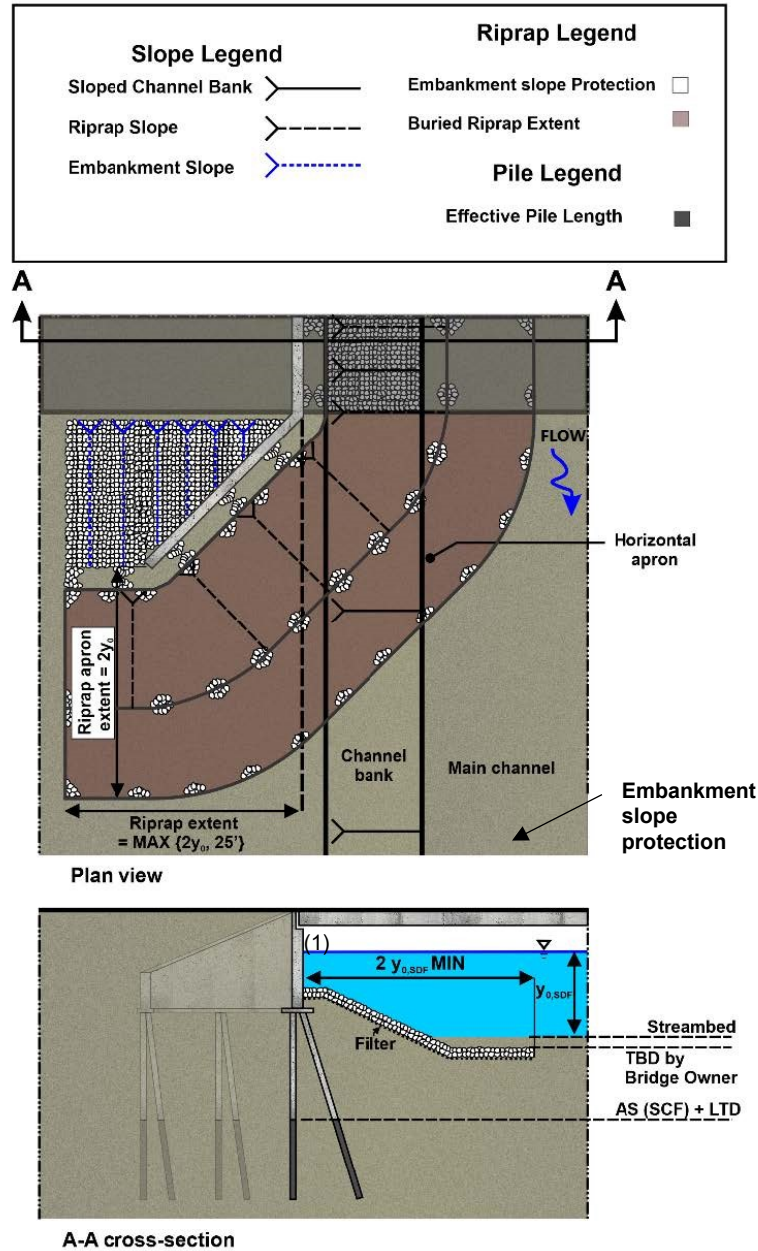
Bridge embankment countermeasure elevation above total scour elevation.
